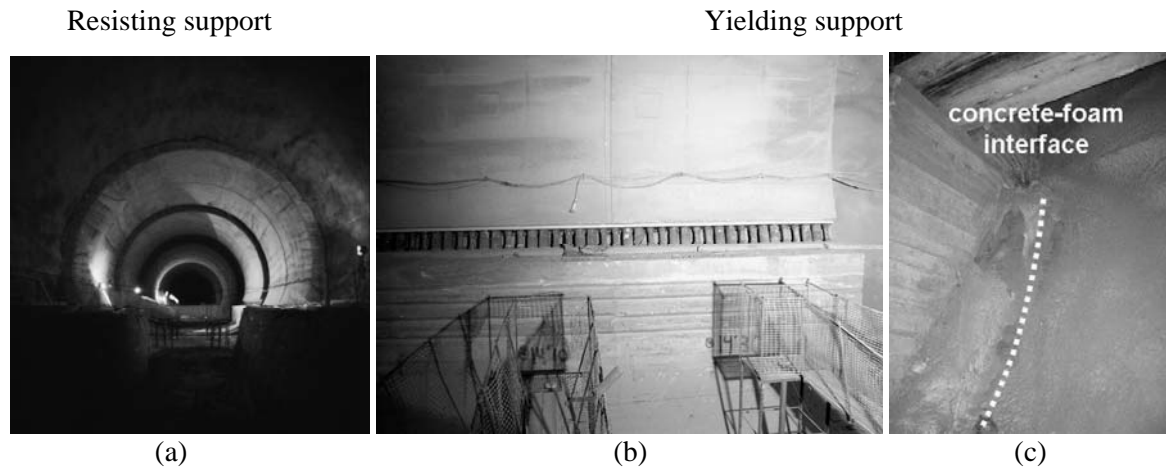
Circular test sections with resisting and yielding supports: (a) rigid section; (b) section with springs; (c) section with foam
